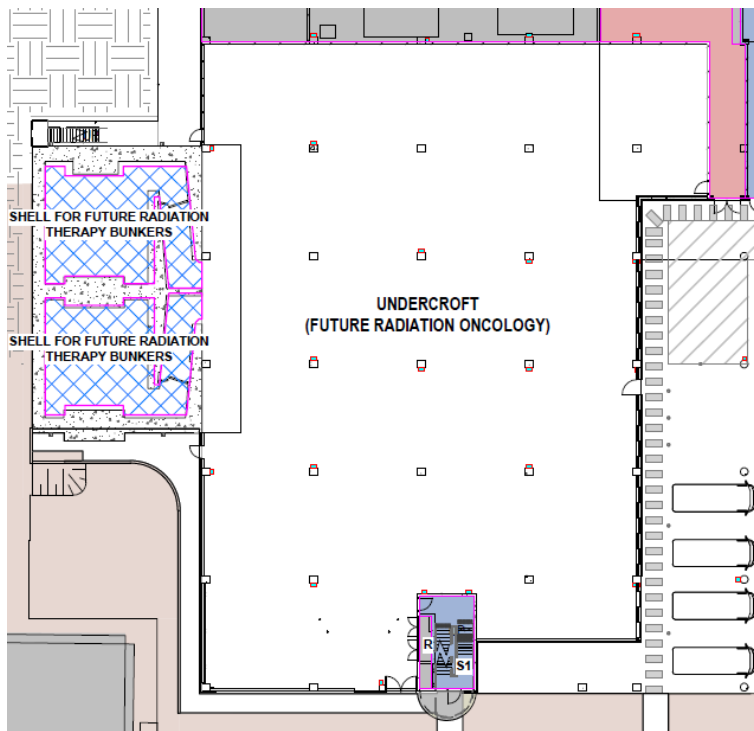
Overall Plan – Basement (Approved Modification 5 Plan)
